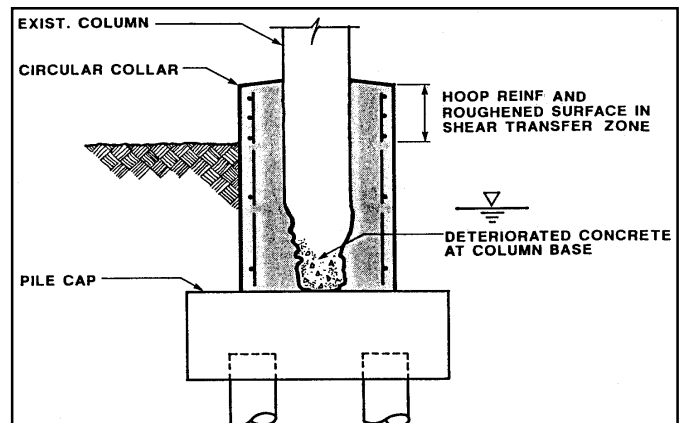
Cutaway view of a shear collar used for repair of deteriorated column base
